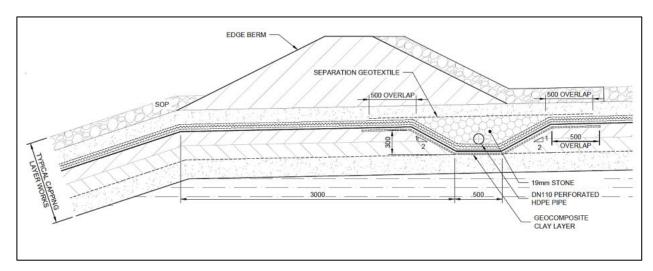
Crest Edge Drain (Drawing 02-T-1228)
